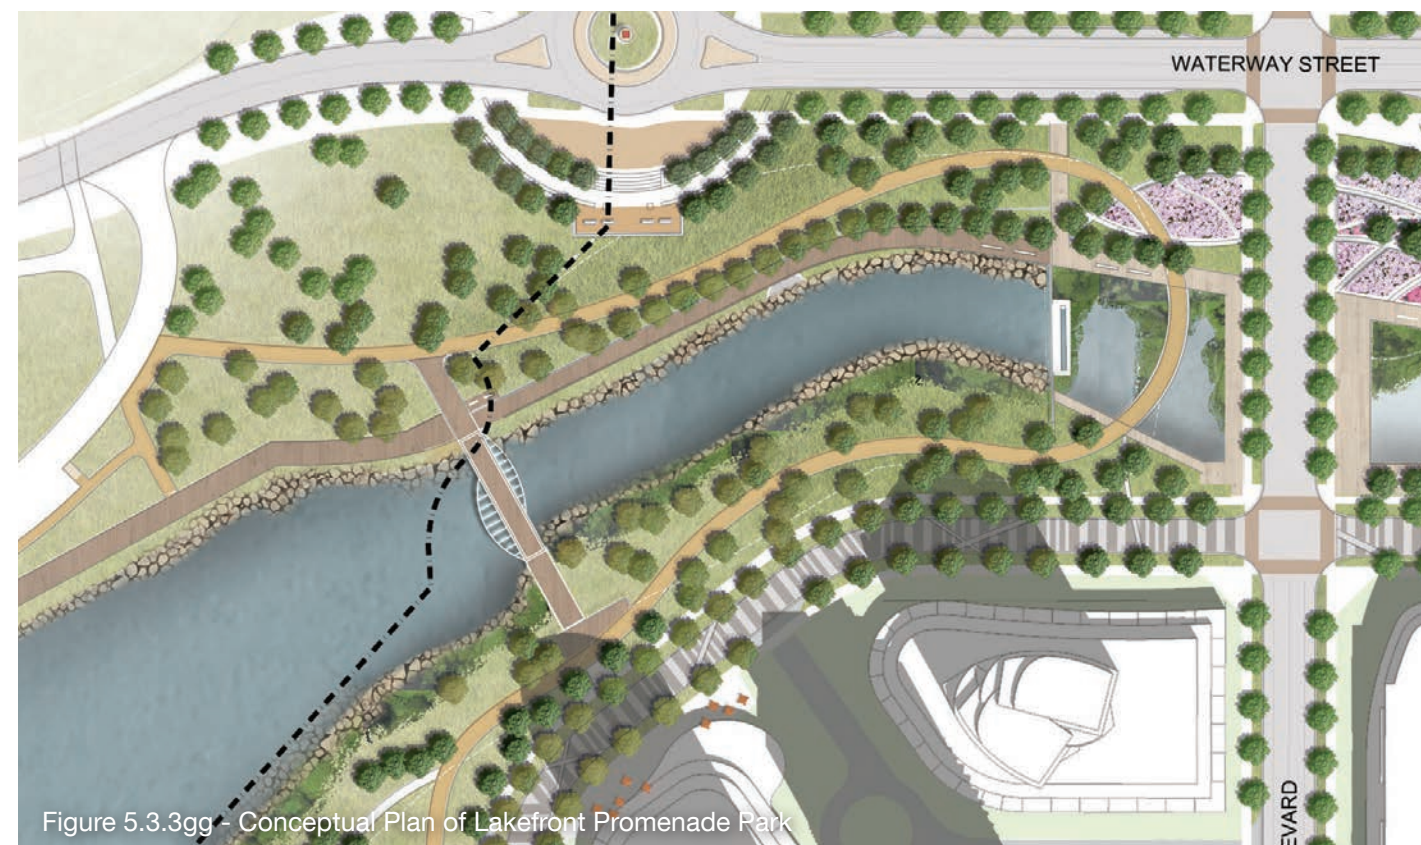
g - Conceptual Plan of Lakefront Promenade Park
